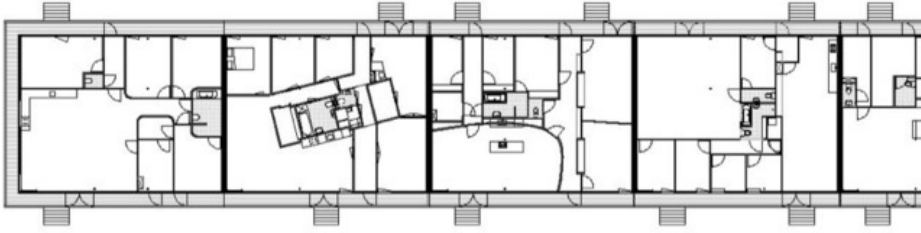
Plan [bureau SLA, n.d.]
